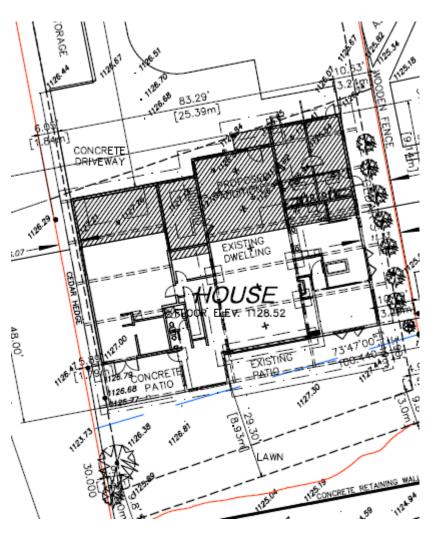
Site Plan with addition floor plan shaded at the Subject Property – From Howe Sound Home Design Development Plans.
